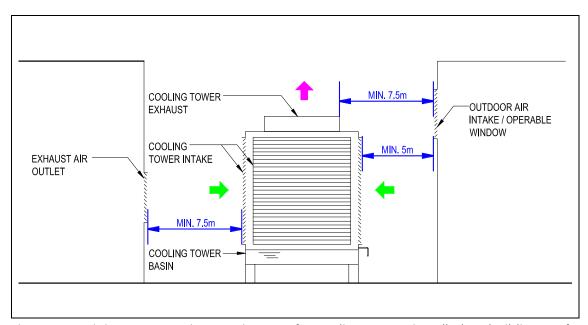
Minimum separation requirement for cooling towers installed on building roof
